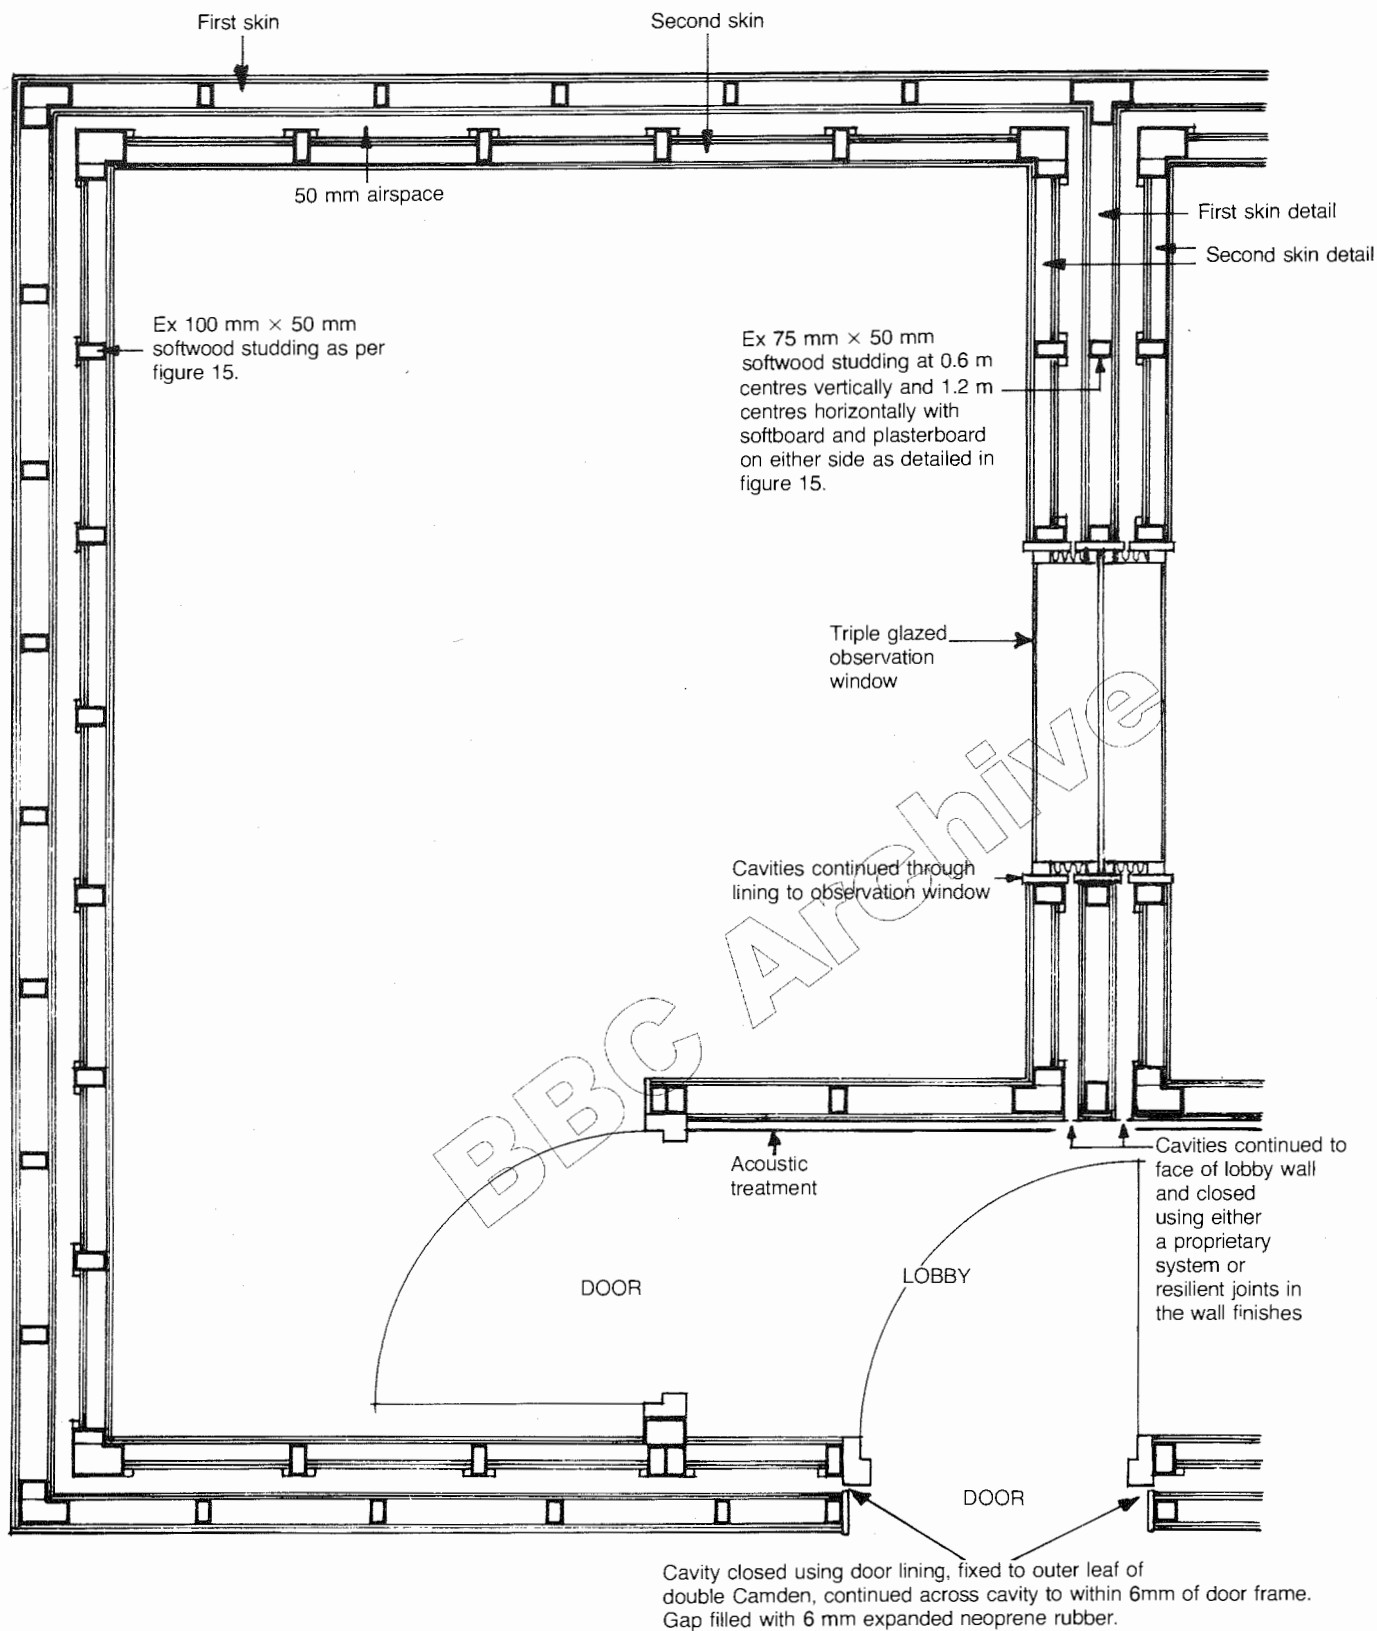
Plan showing typical details of studio construction using single, double, and triple Camden partitions
